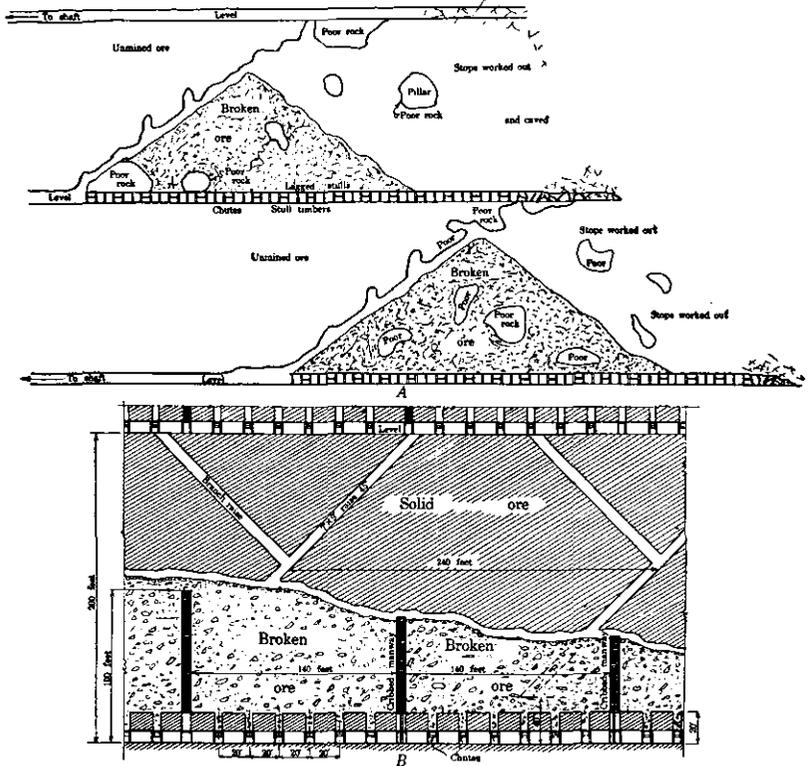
Shrinkage stoping; A, Longitudinal inclined shrinkage stoping on timbers; B, shrinkage stoping over box-hole pillars at Kirkland Lake, Ontario
